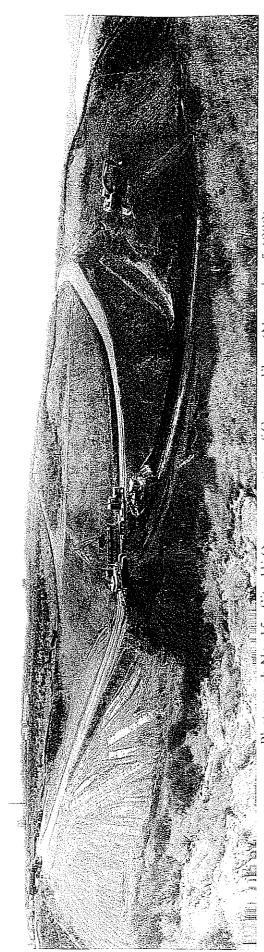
Site 1E Slope Haul Road Construction Activities (October 8, 1999) PCL # 3
